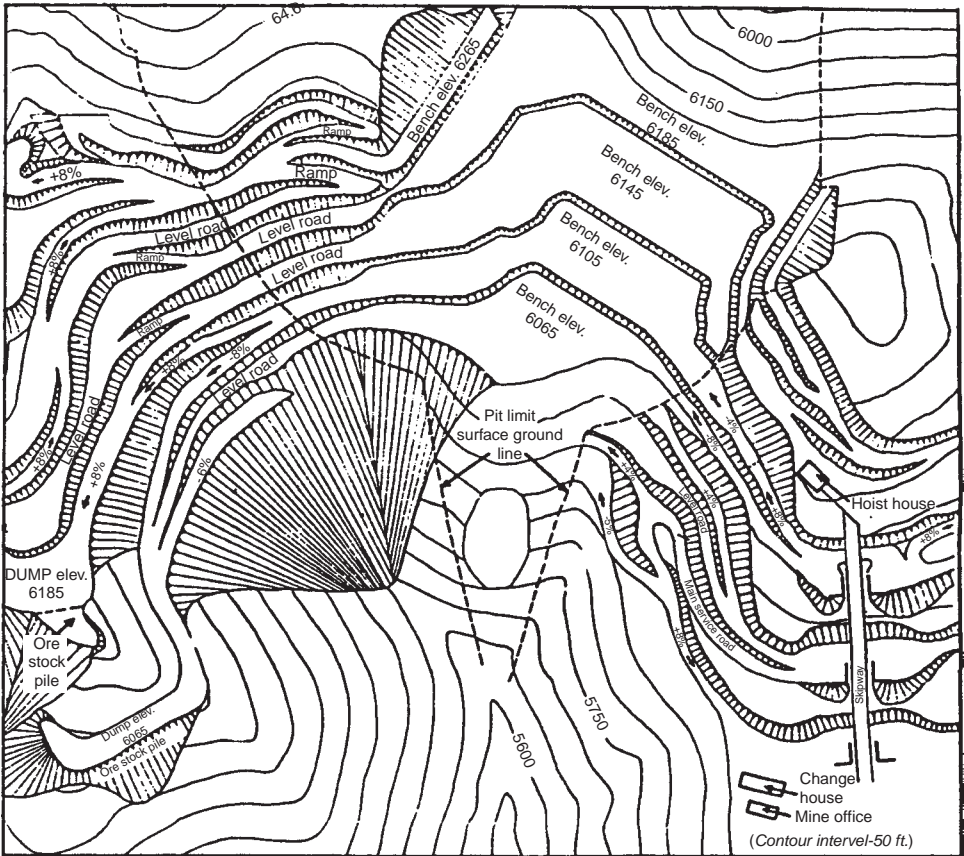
Example of slope surface shading described in Figure 4.78 (Ramsey, 1944).
